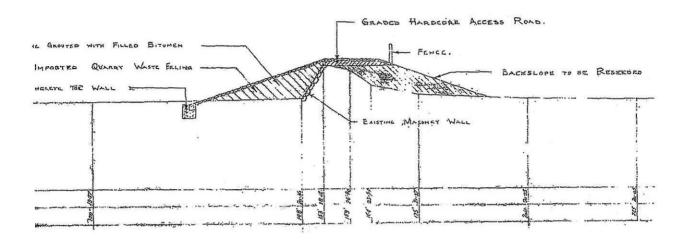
Somerset Rivers Board, Clevedon Sea Wall Scheme 3, 1958, construction diagram.
